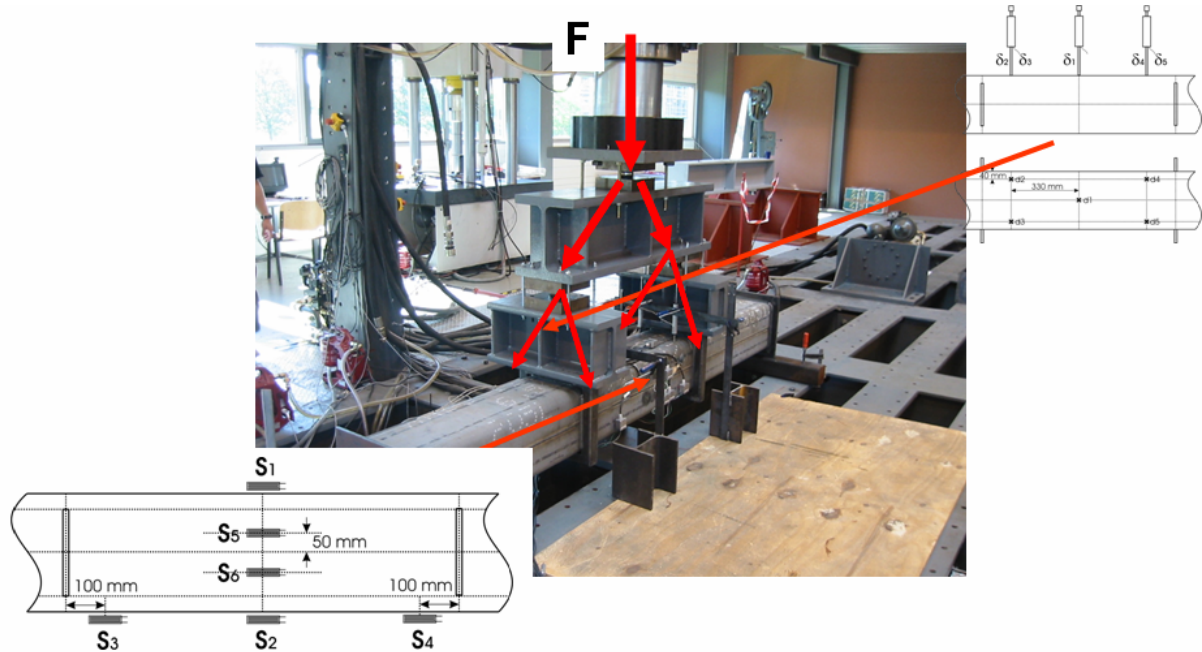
4-point-bending tests of beams with hollow sections [6]
